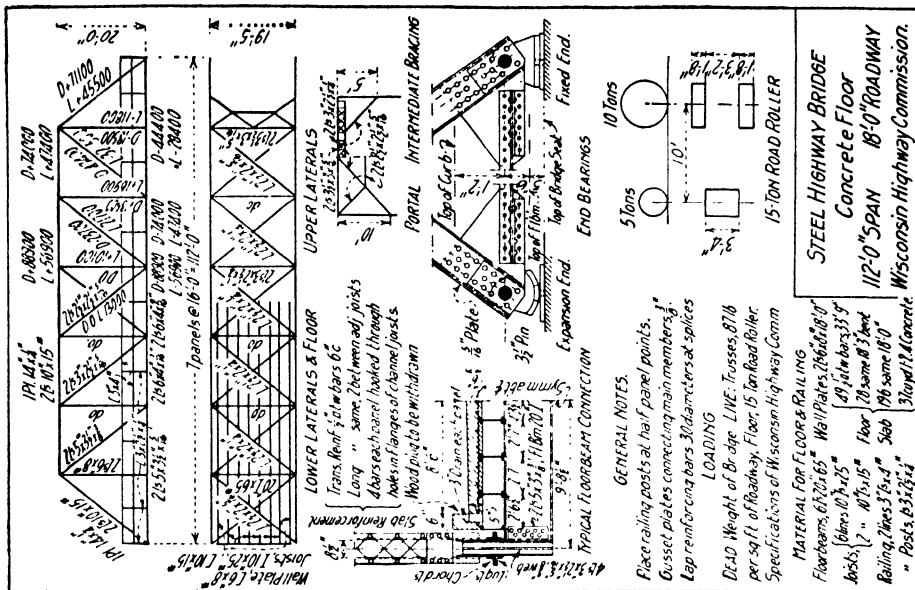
HIGH TRUSS STEEL HIGHWAY BRIDGE.
